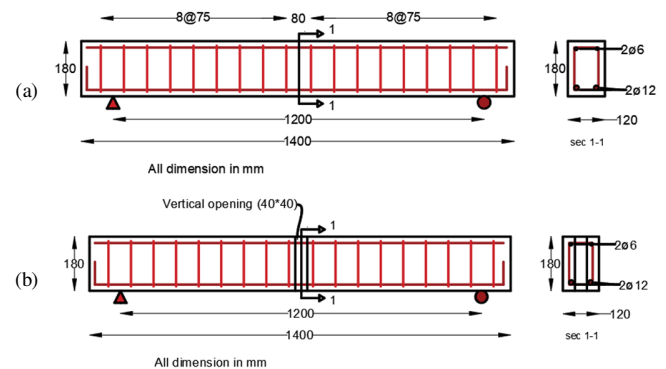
Geometric and reinforcement details (side view): (a) reference beam, (b) beam with square opening.
